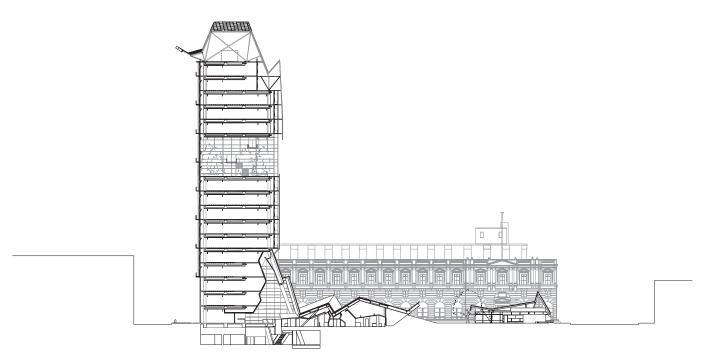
Section through the center of the San Francisco Federal Building showing the sky garden, which starts at the 11th floor. (Drawing courtesy of Morphosis Architects)
